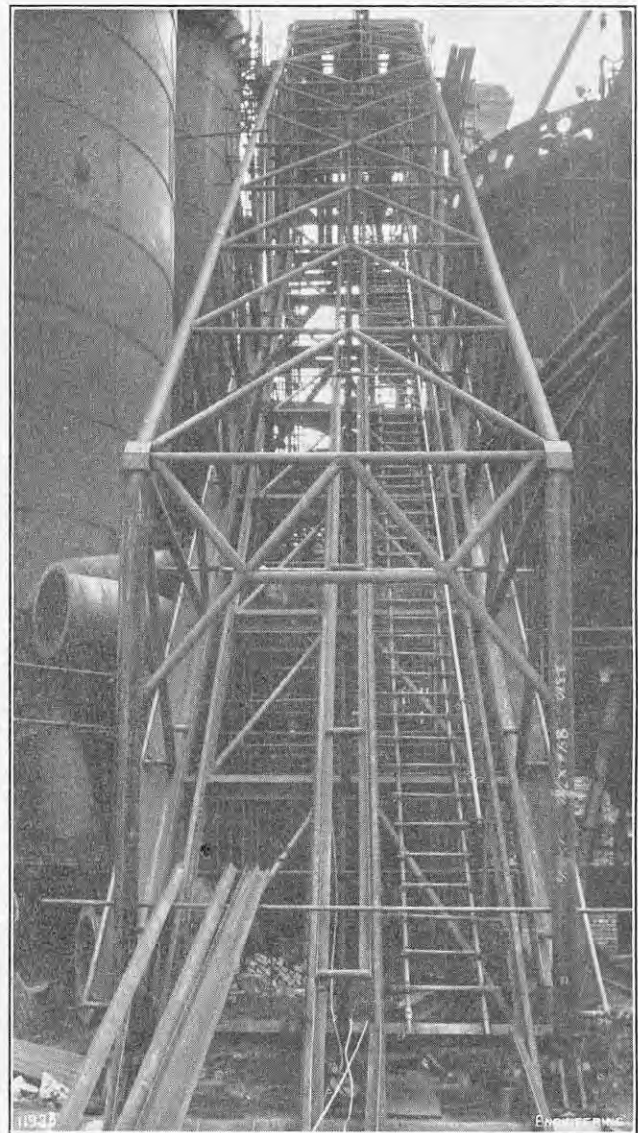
ERECTING BRIDGE BETWEEN STOVES AND FURNACE.
